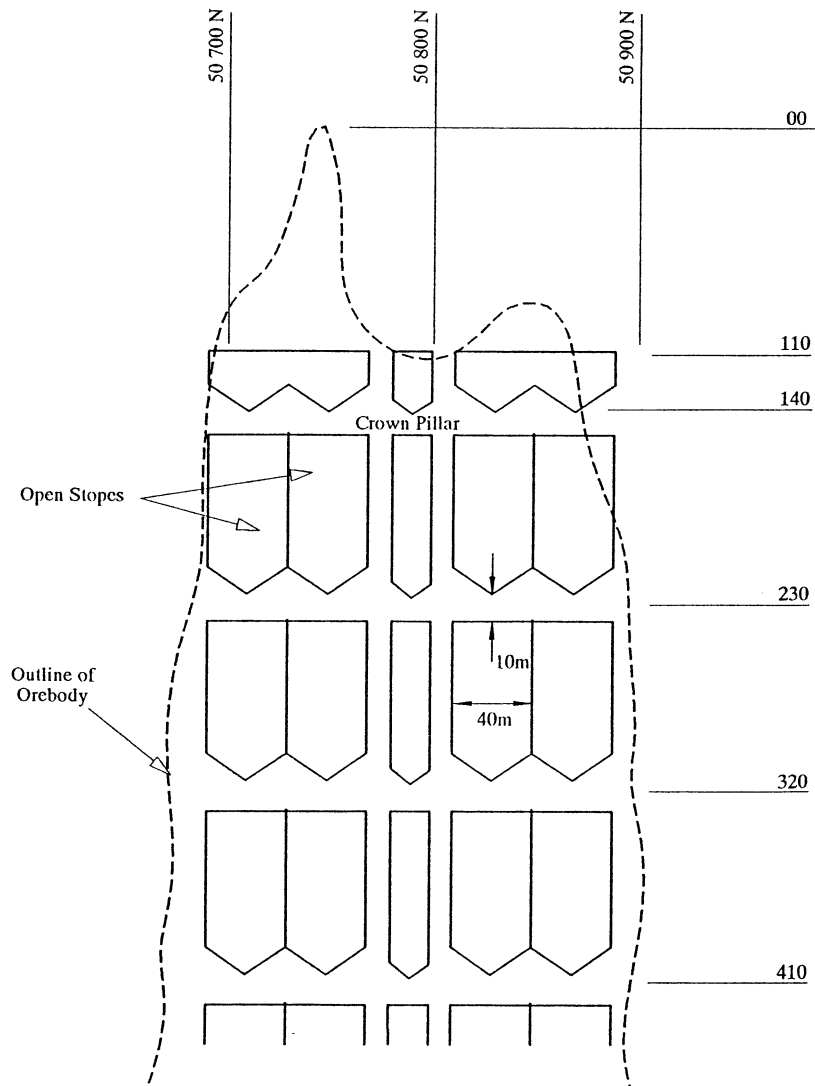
Elura Mine Proposed East-West Stope Layout
